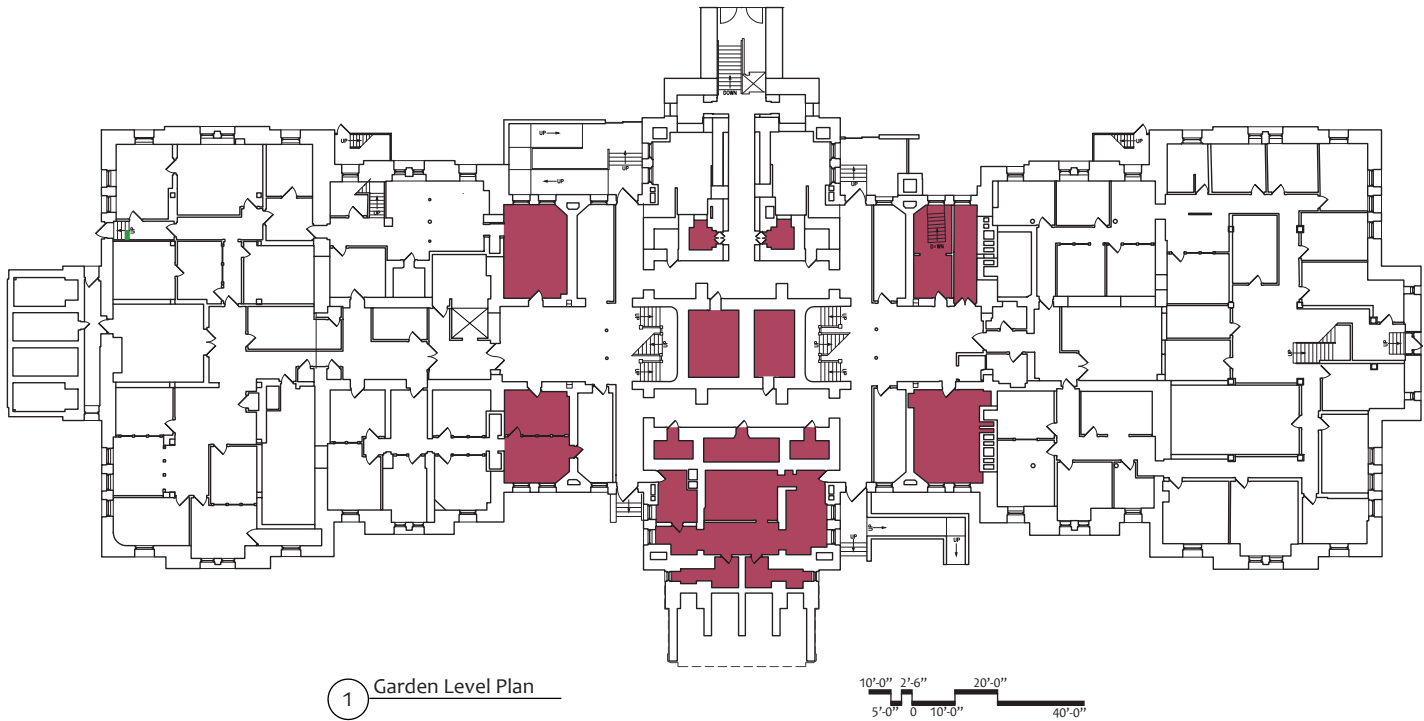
Garden Level Plan [Support/Service Areas highlighted in dark red]
